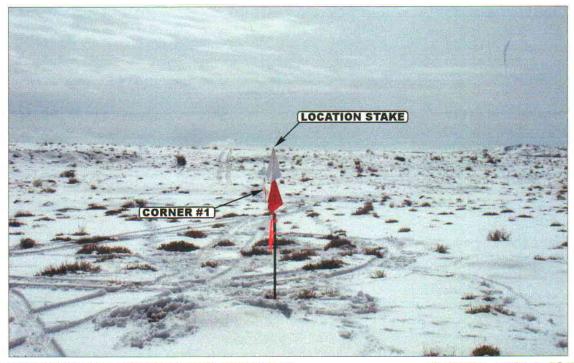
PHOTO: VIEW FROM LOCATION STAKE TO CORNER #1
